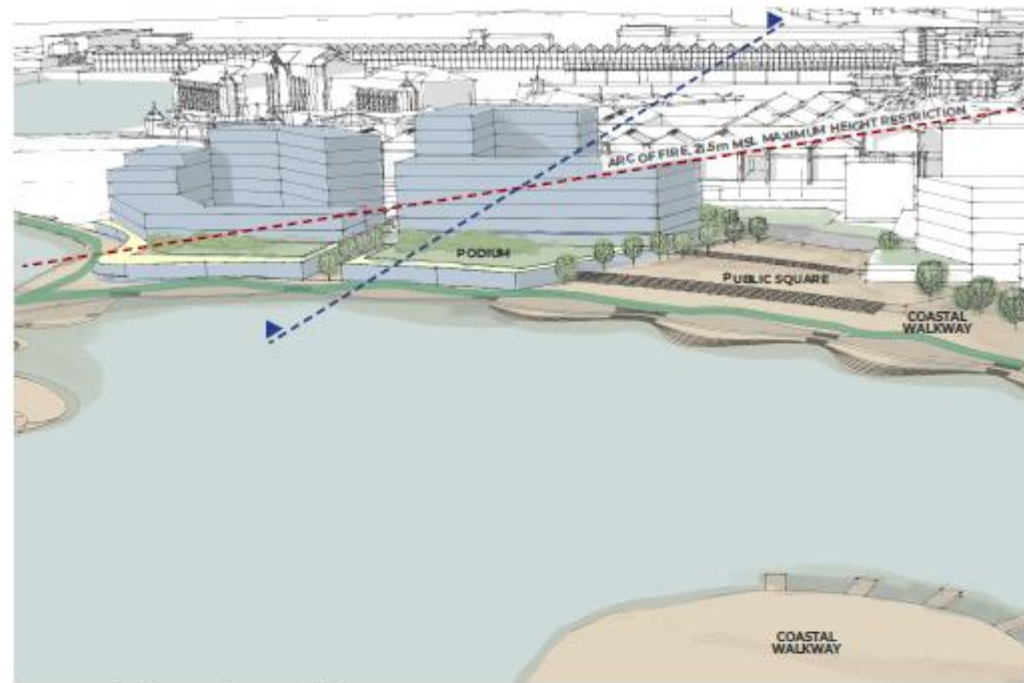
VIEW 6: PACKAGE 13 & 14 APPLICATION OF DESIGN CONSTRAINTS
